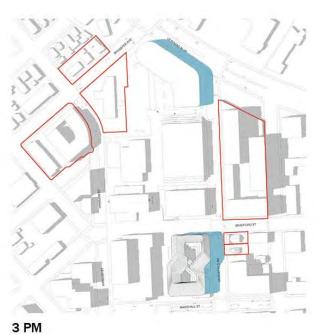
New Shadows from Proposed Parking Garage & COB3 Buildings - June 21
